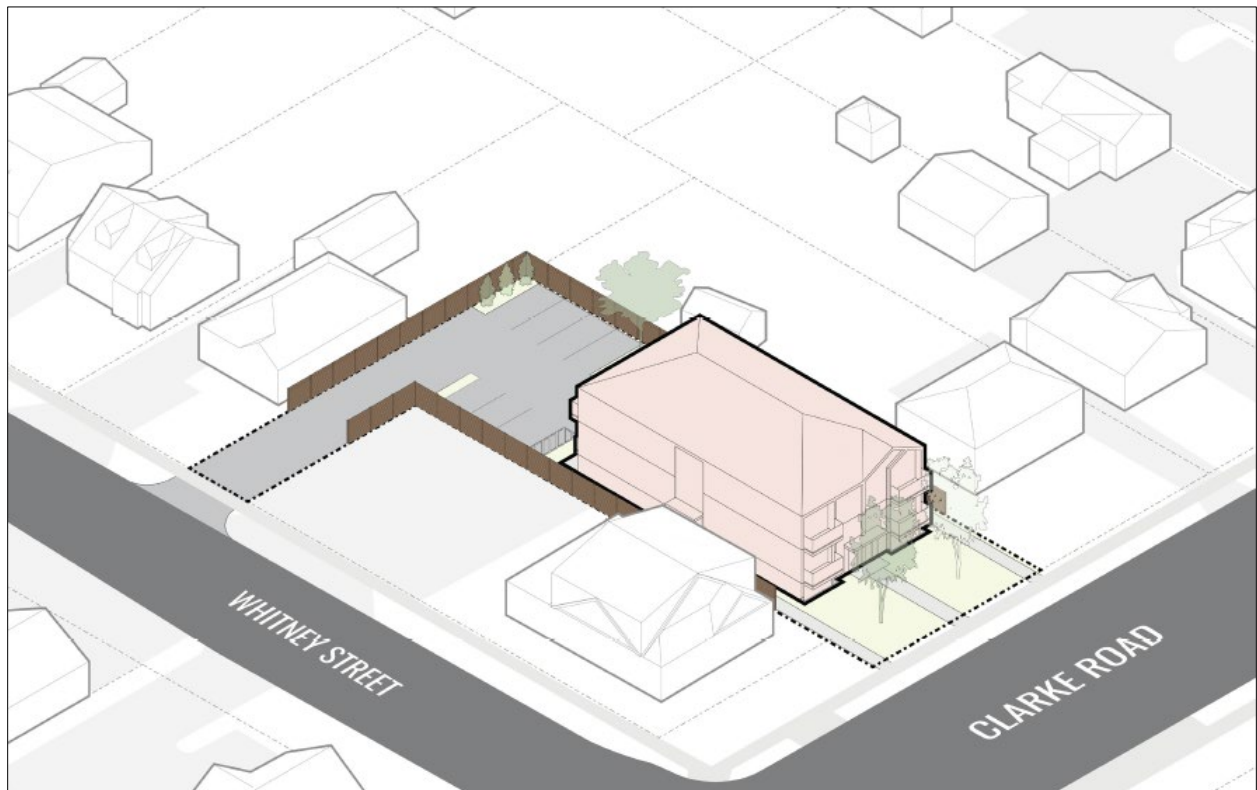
Rendering of proposed apartment building (Received August 2024)
